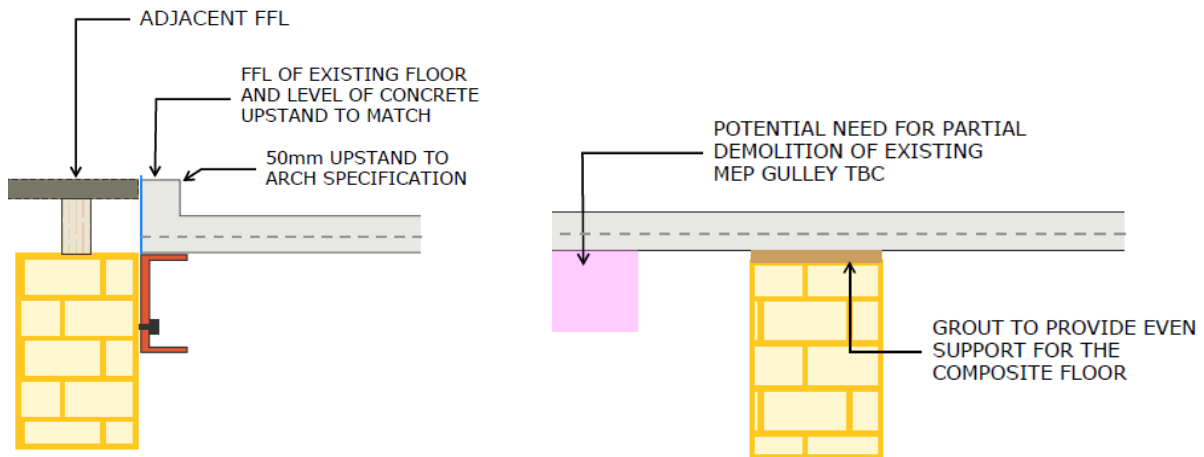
The MEP loading has determined the floor thickness and support arrangement.
